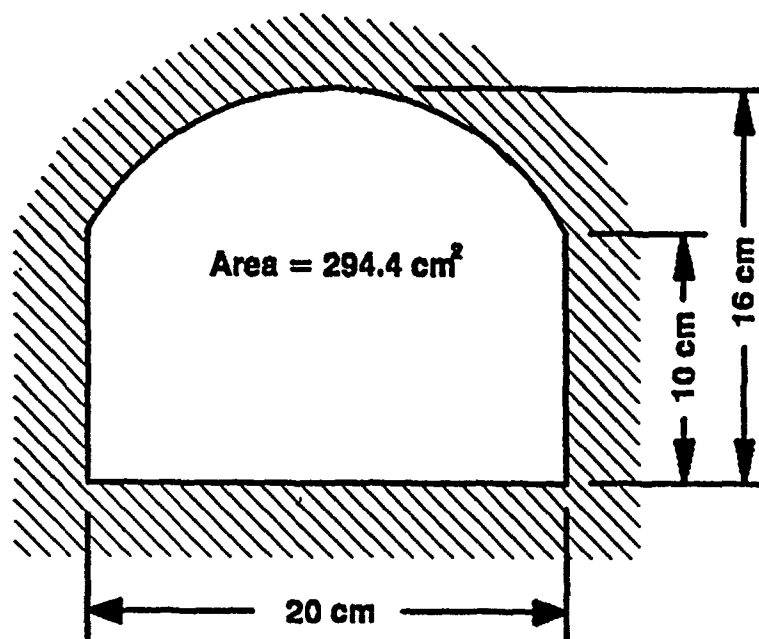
Storage chamber cross-section for 1:25-scale WES Brick Model Tests.
